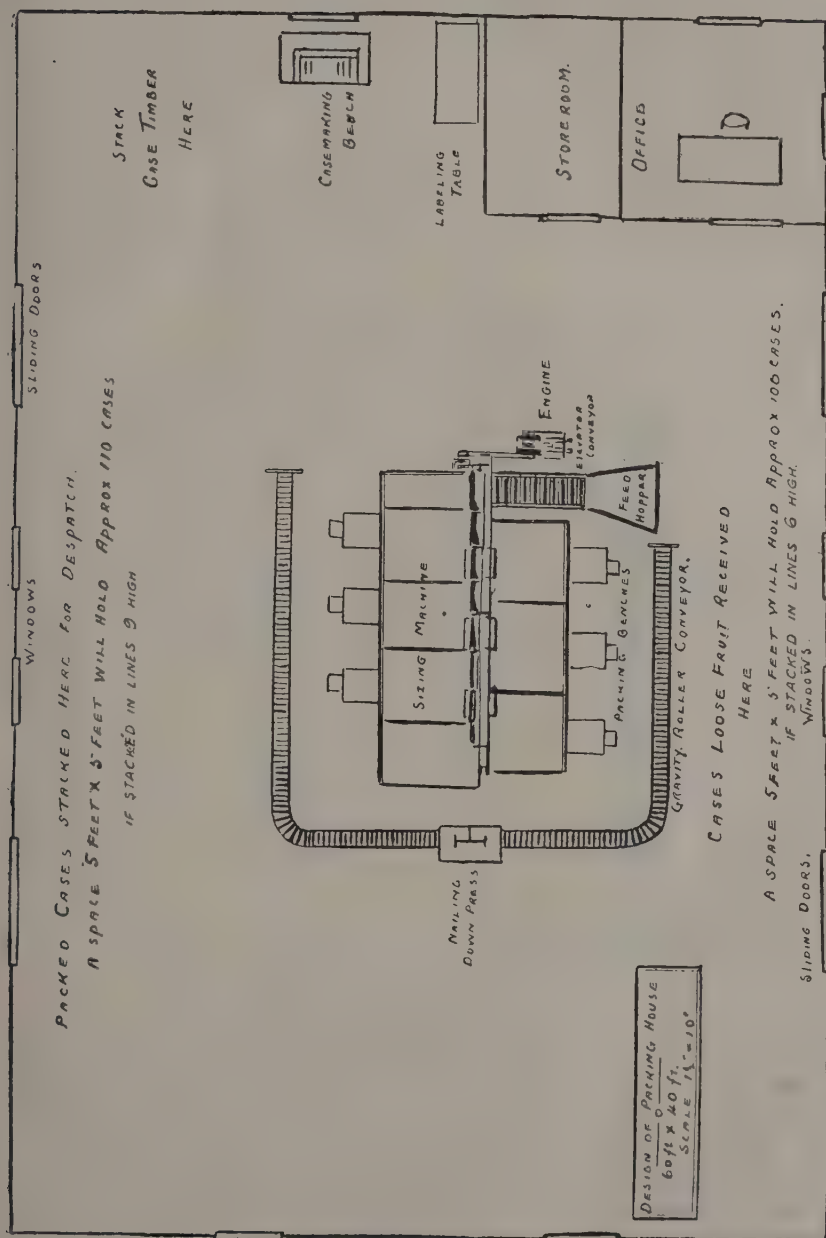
(Fig. 1).—PACKING SHED LAYOUT.
